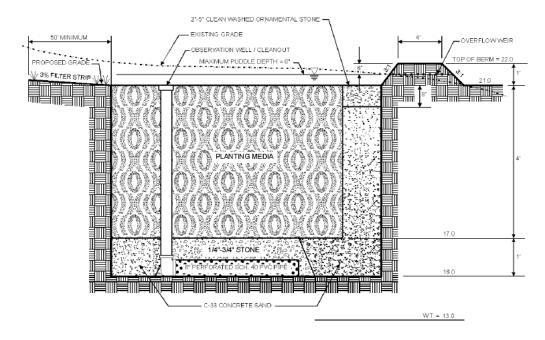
Bioretention Facility Typical Section Source: GSMM (2001)
